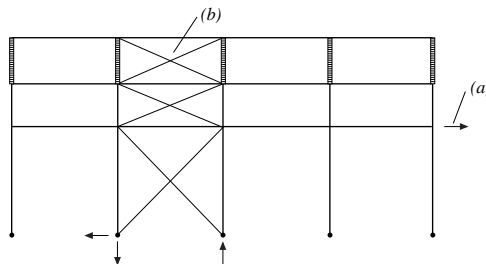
Transfer of external loads through bracing into the foundation. (a) Braking forces of a crane, (b) bracing to provide torsional resistance at beam ends. (STEP 1995 Article D9)
